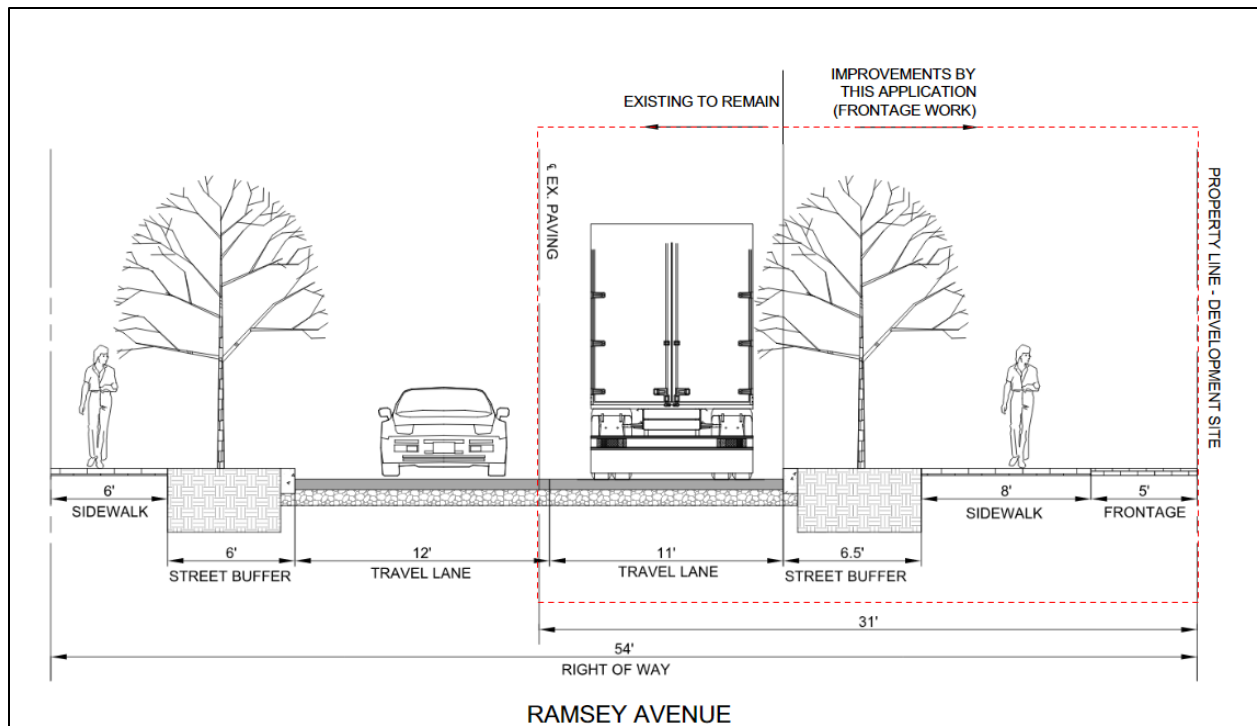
Proposed Cross Section of Ramsey Avenue, Applicant contribution shown in dashed lines
